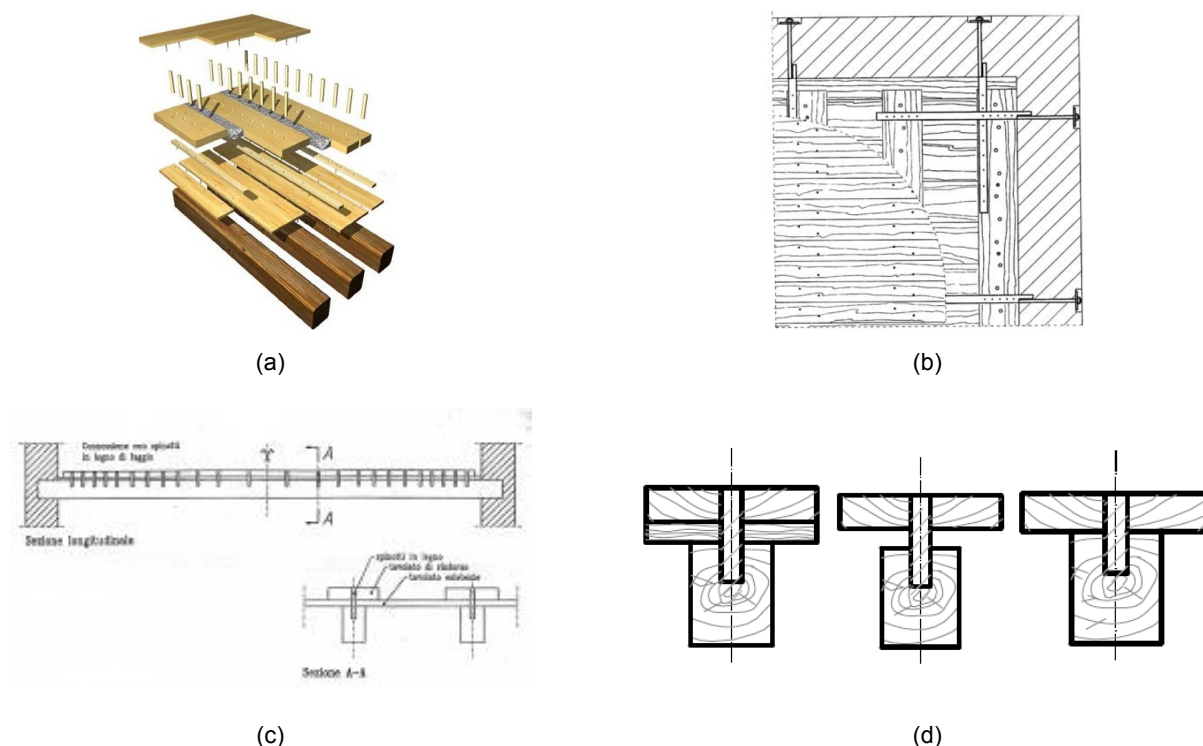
(a) Wood-wood floor: prospective view of the composing elements, (www.unibs.it/centrosismo/schede). (b) Detail of the connection to the walls. (c) Qualitative design example, the variable step (spacing) of the connectors, (Modena et al., 1997c). (d) combined flexural and shear (left), bending (centre), pure shear (right).
